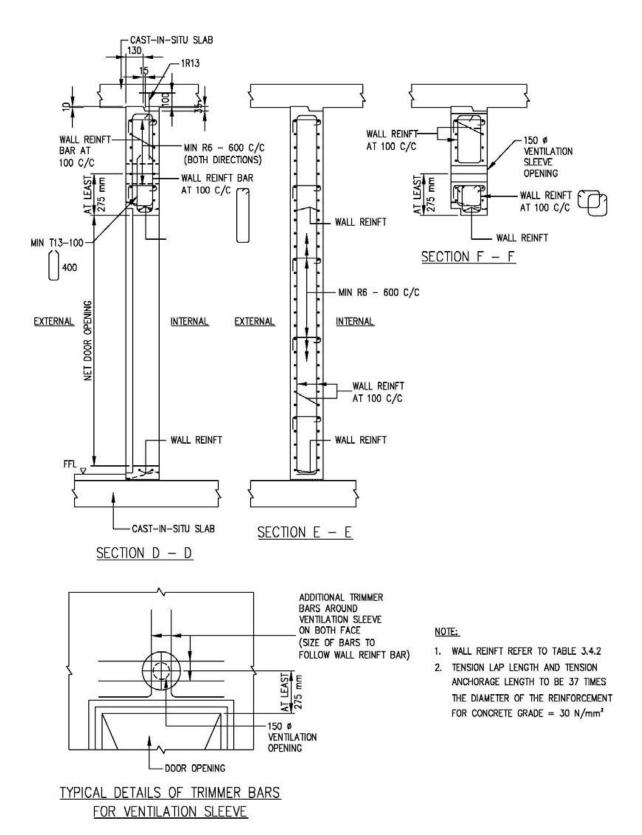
(b) DETAILS AND SECTIONS OF PRECAST SS DOOR FRAME PANEL WITH VENTILATION SLEEVE ABOVE IT (TYPE 1)
